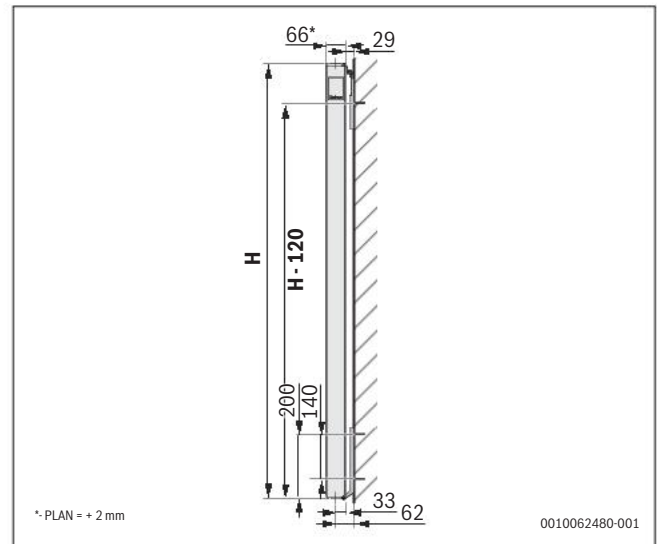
Installing radiators types 20 for CV Profil/ Plan.2
